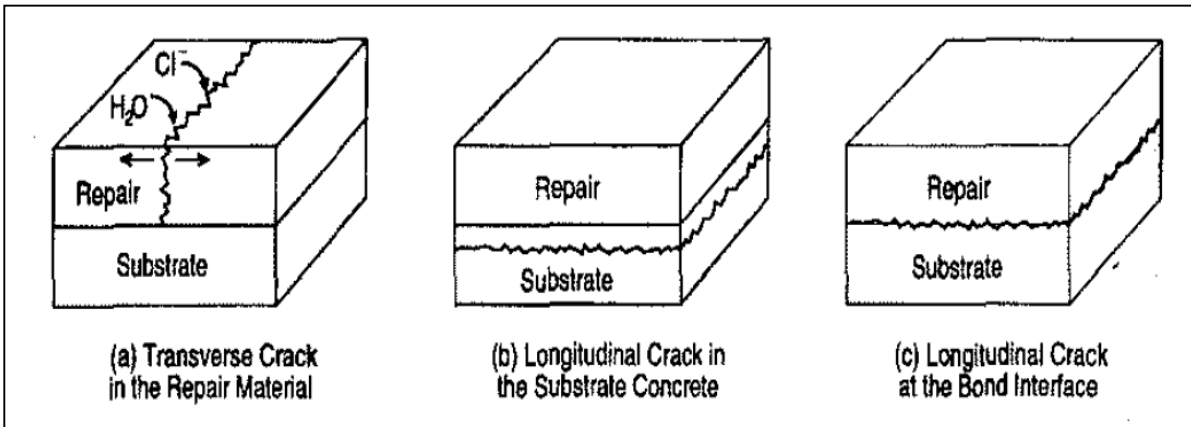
Failure mechanisms in patch repairs (Cusson & Mailvaganam, 1996)
